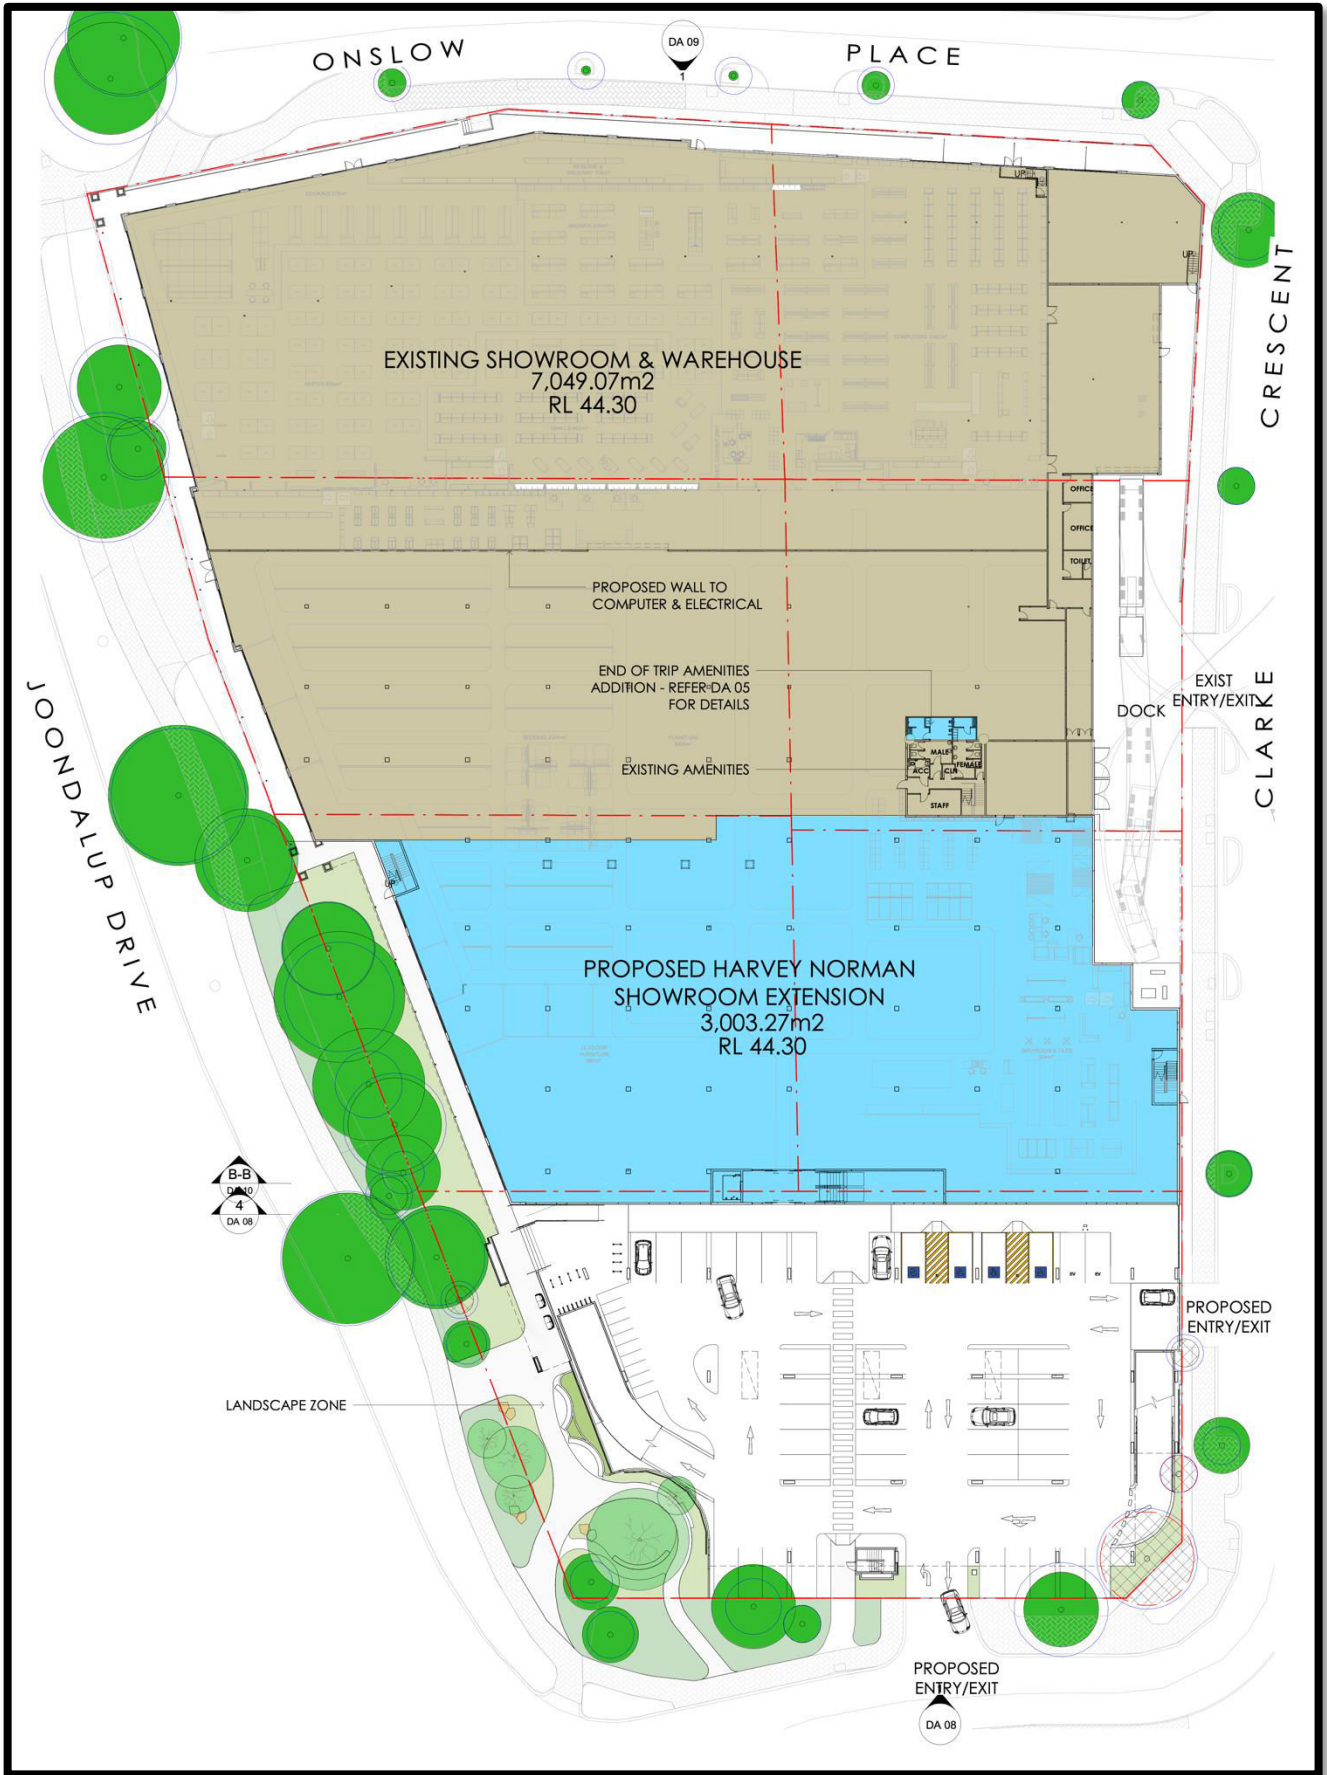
Proposed Ground Floor Plan (Courtesy of Leffler Simes Architects)
